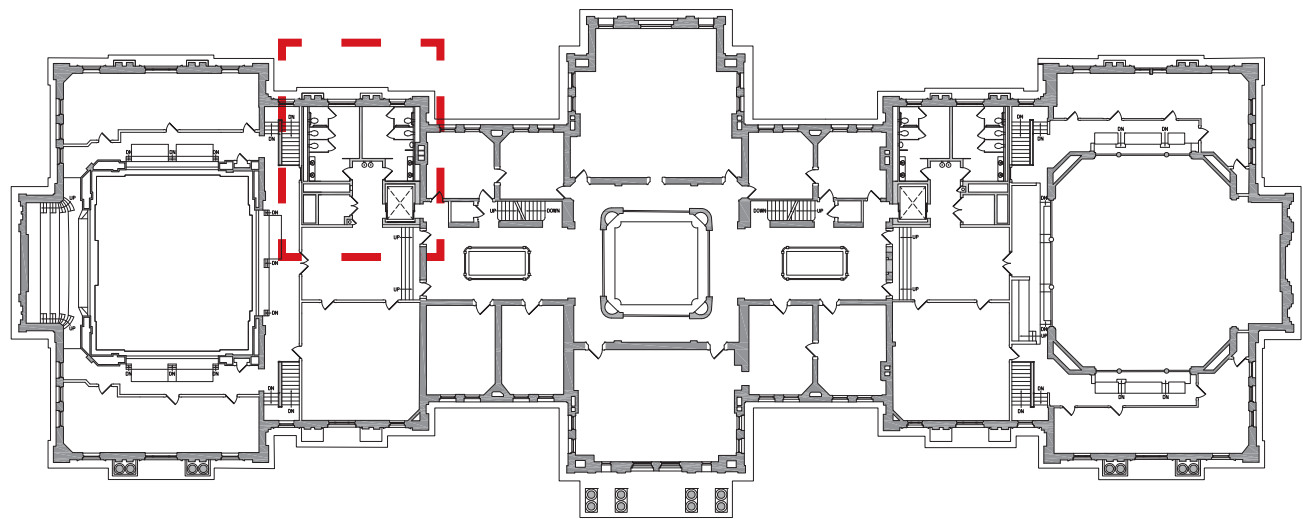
Potential Third Floor Level Plan Layout.
